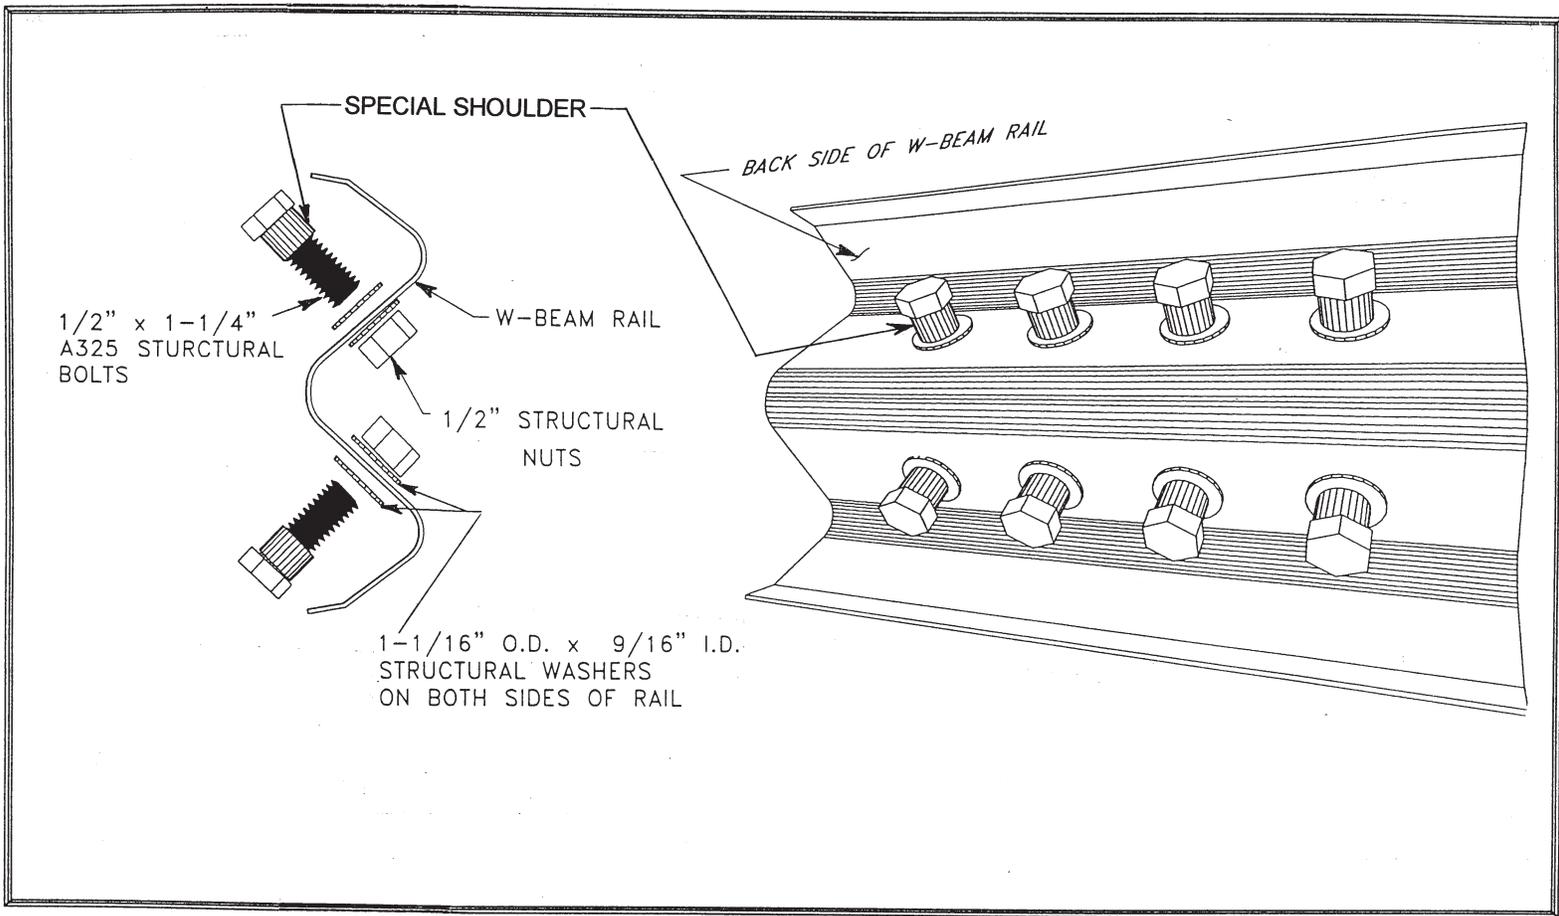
Installation of Cable Anchor Bracket Shoulder Bolts.
